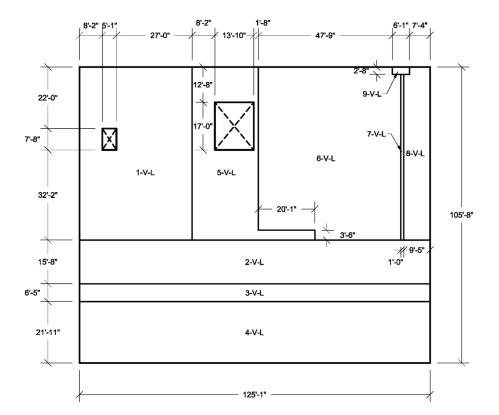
H.3-21 East Wall Looking West Vertical Reinforcement Zones Far Side Face
